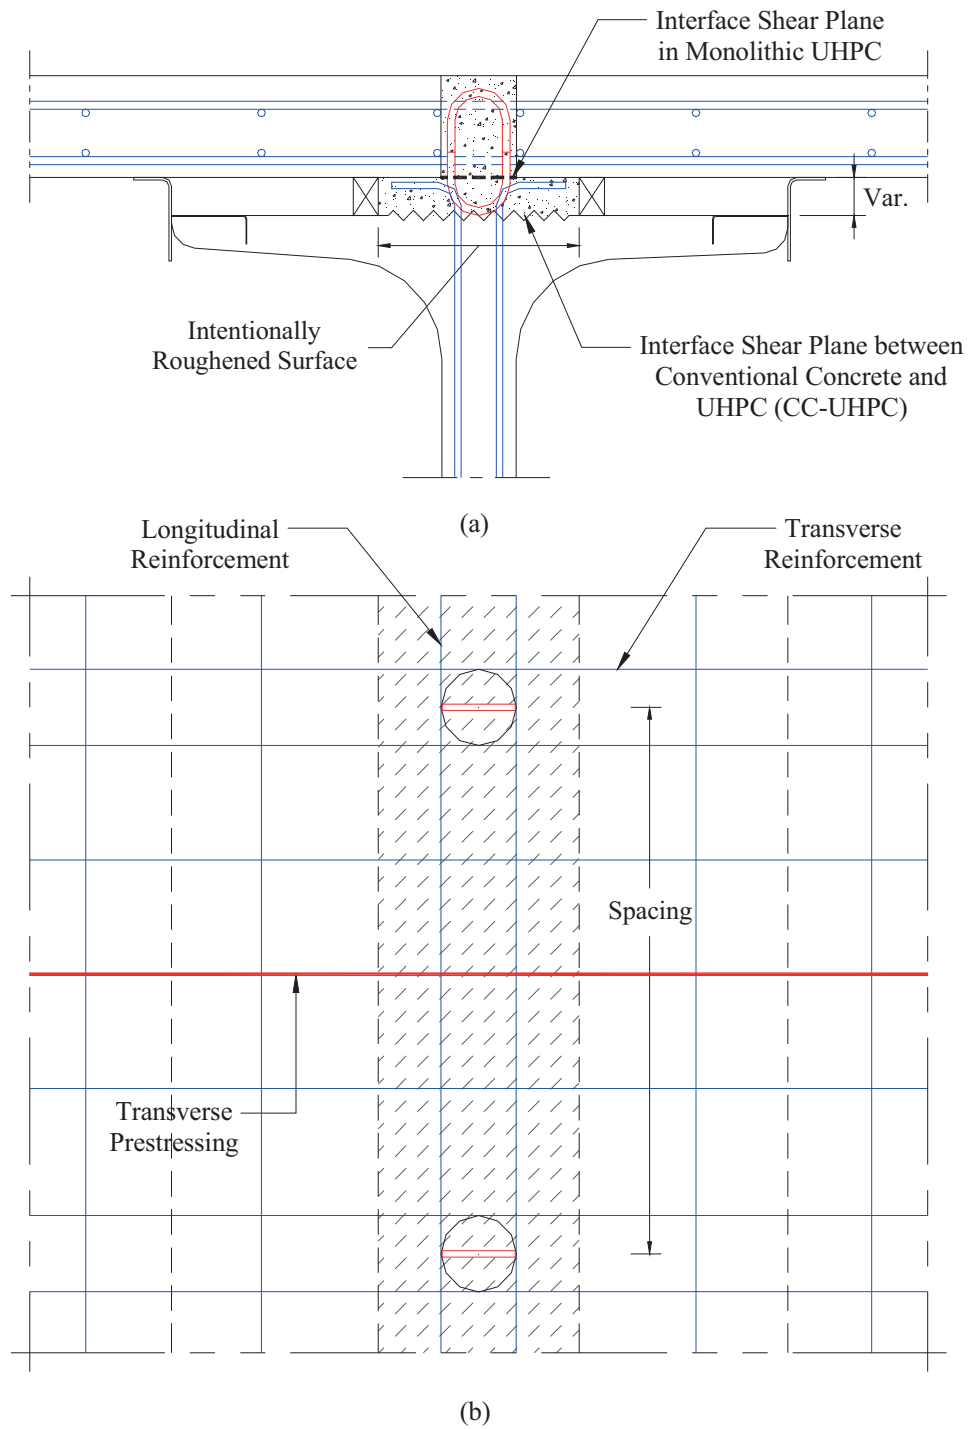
Interface Shear Resisting Area; (a) at the Top of the Concrete Girder and (b) at the Soffit of the Deck Panels
